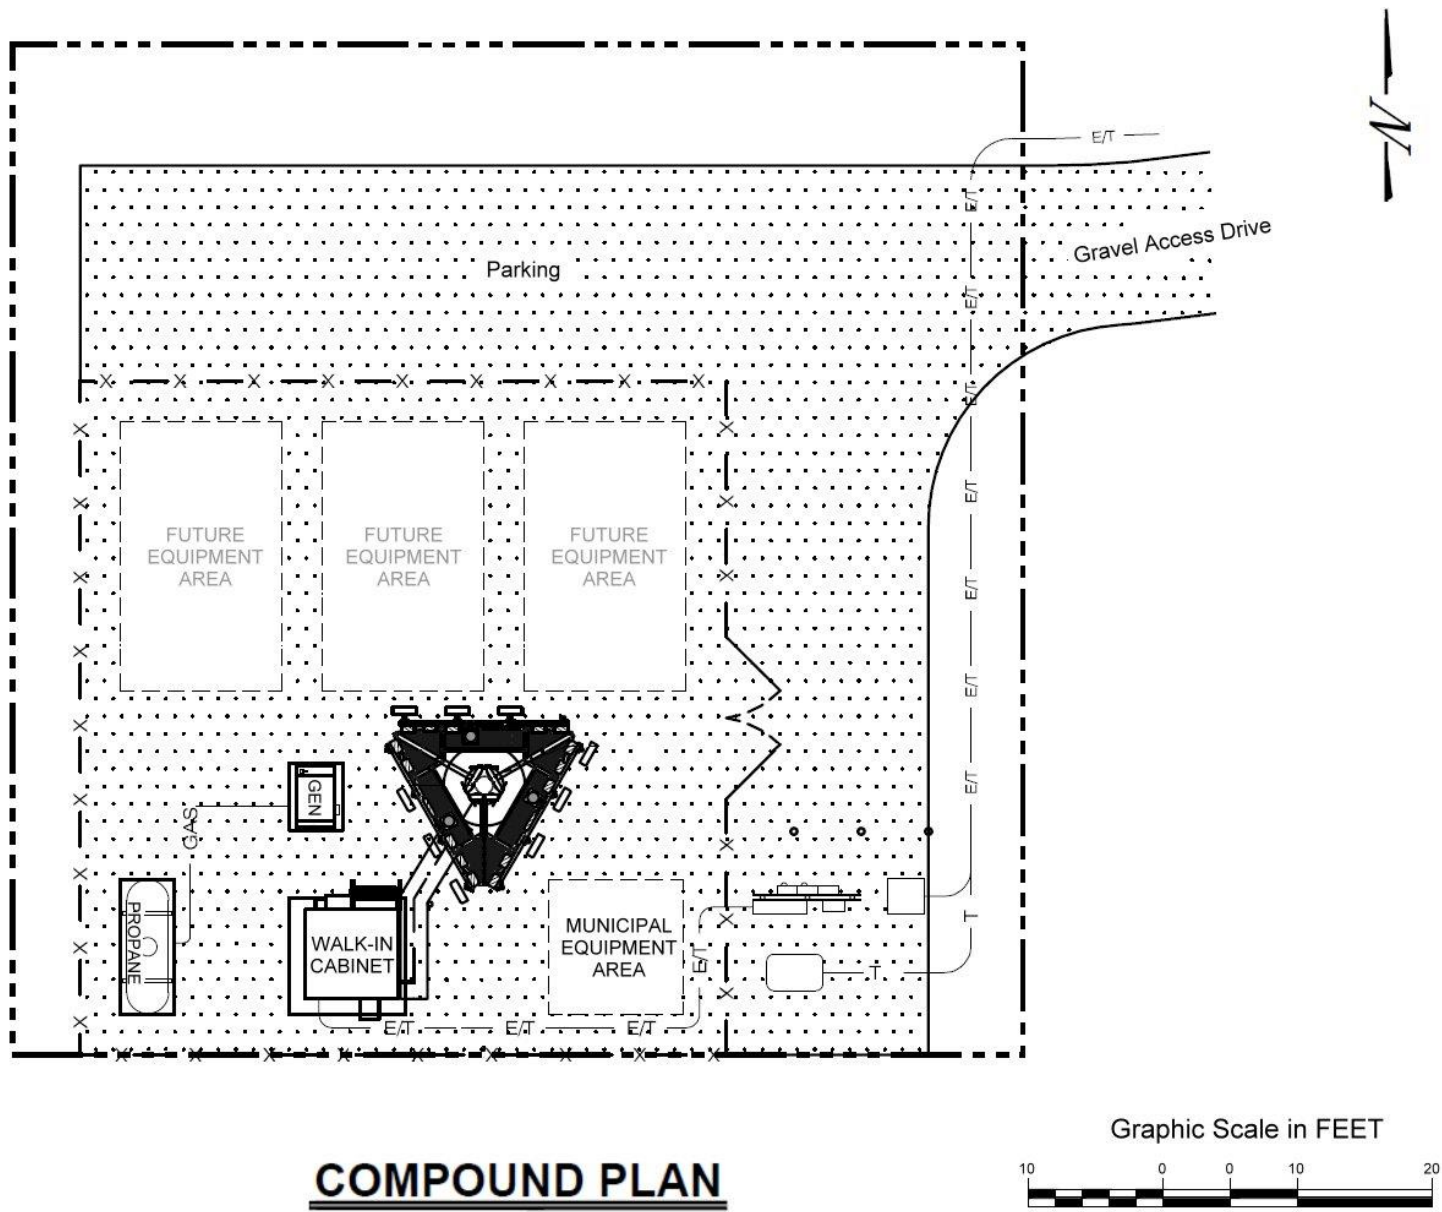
Plan Showing the Proposed Layout of the Equipment Compound
